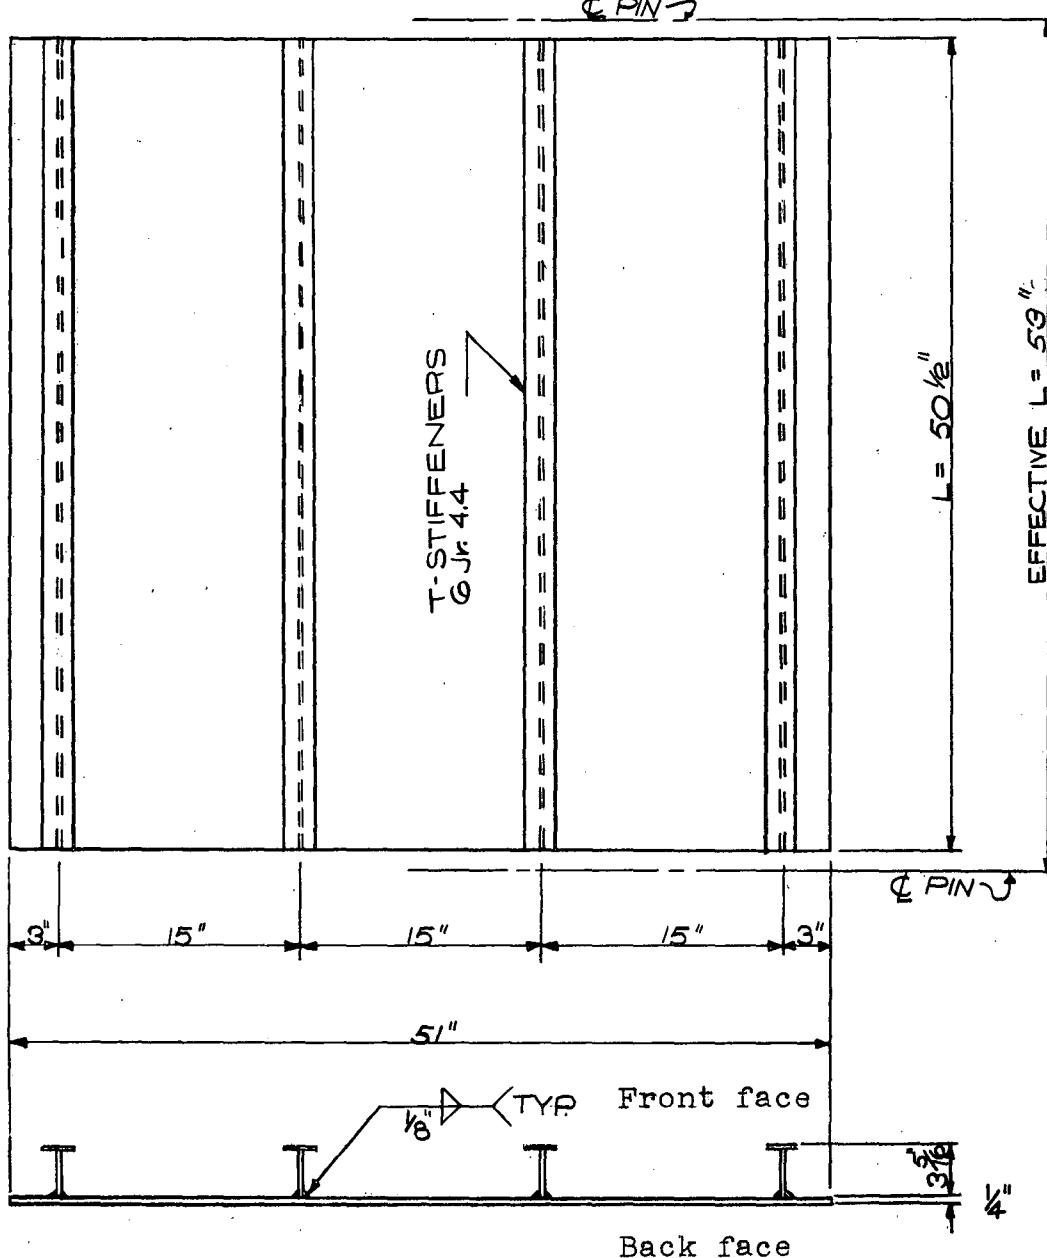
TEST SPECIMEN DIMENSIONS (T-7, T-8, T-9)
